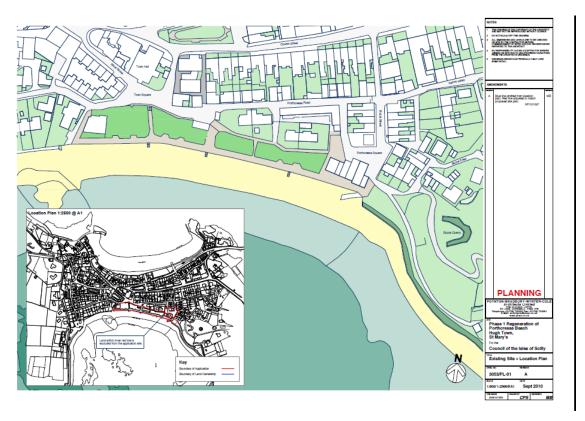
Existing site plan and location (Poynter Bradbury Wynter Cole Architects Ltd)
